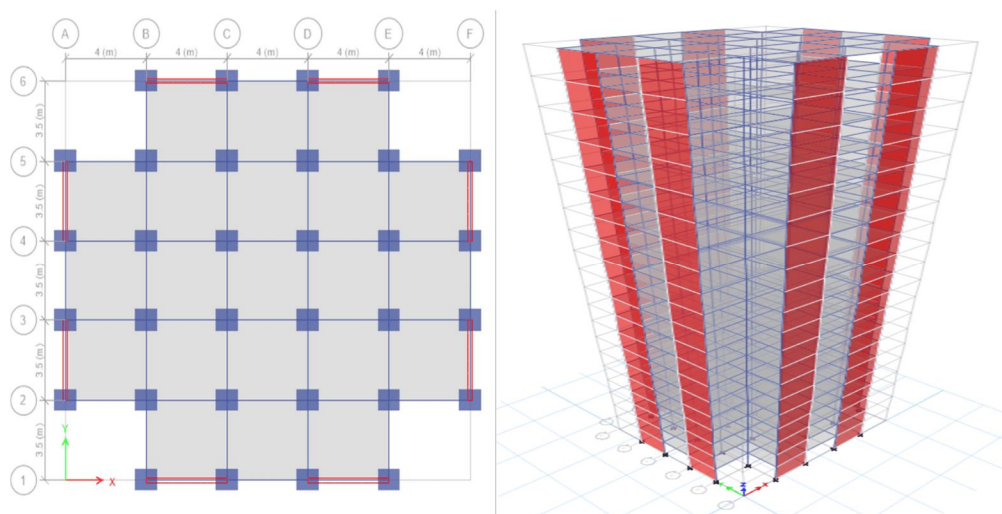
Plan and 3D view of Irregular building with shear walls at corners on each side
